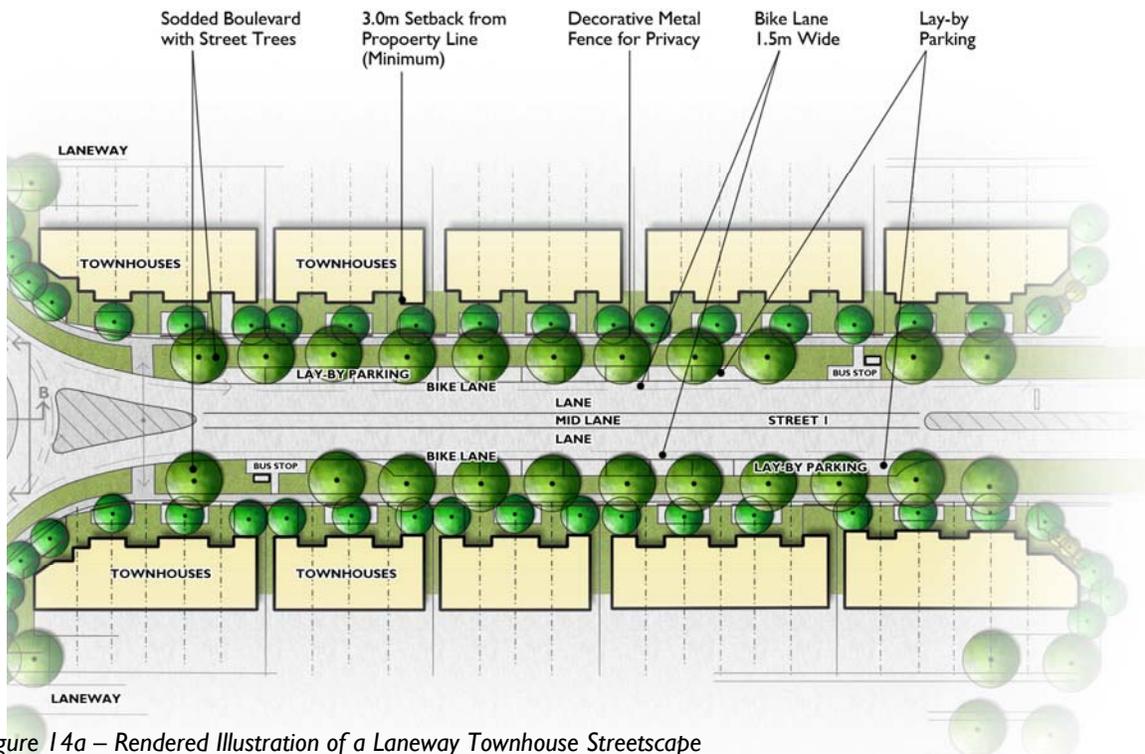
Rendered Illustration of a Laneway Townhouse Streetscape
